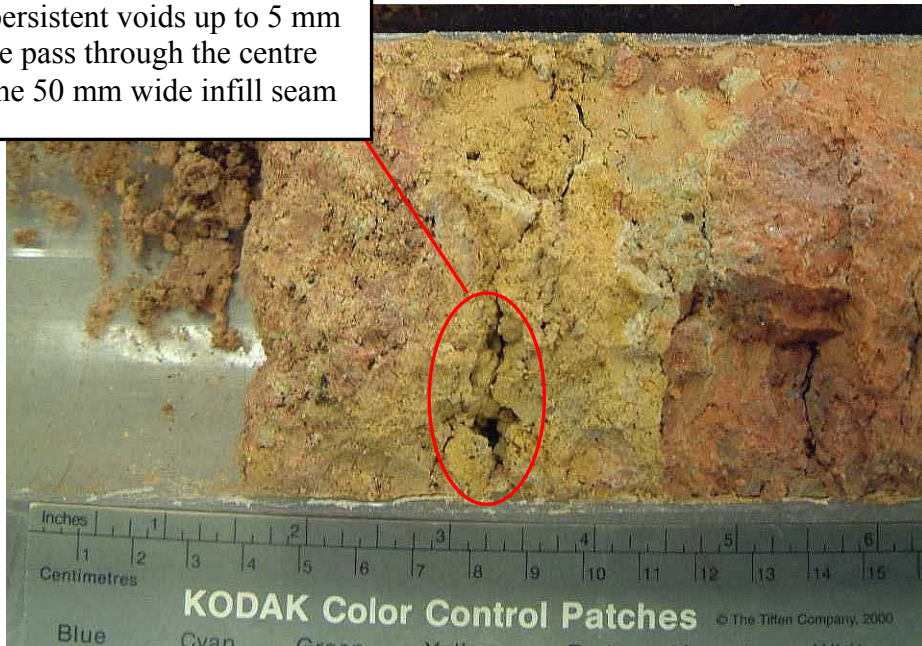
View of 50 mm Infill Seam in Drillhole BH2 at a Depth of 3.7 m
